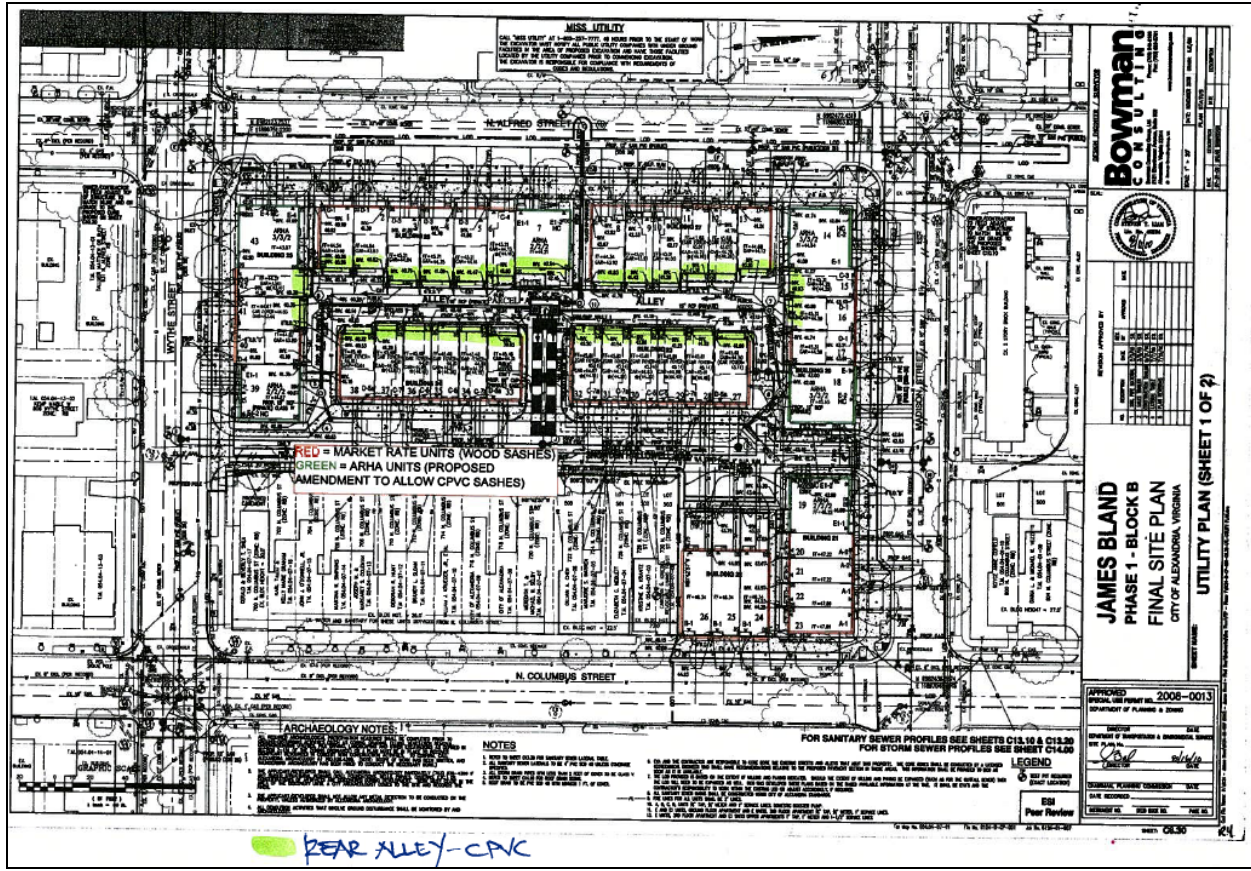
Diagram illustrating which elevations are proposed to have vinyl windows.
